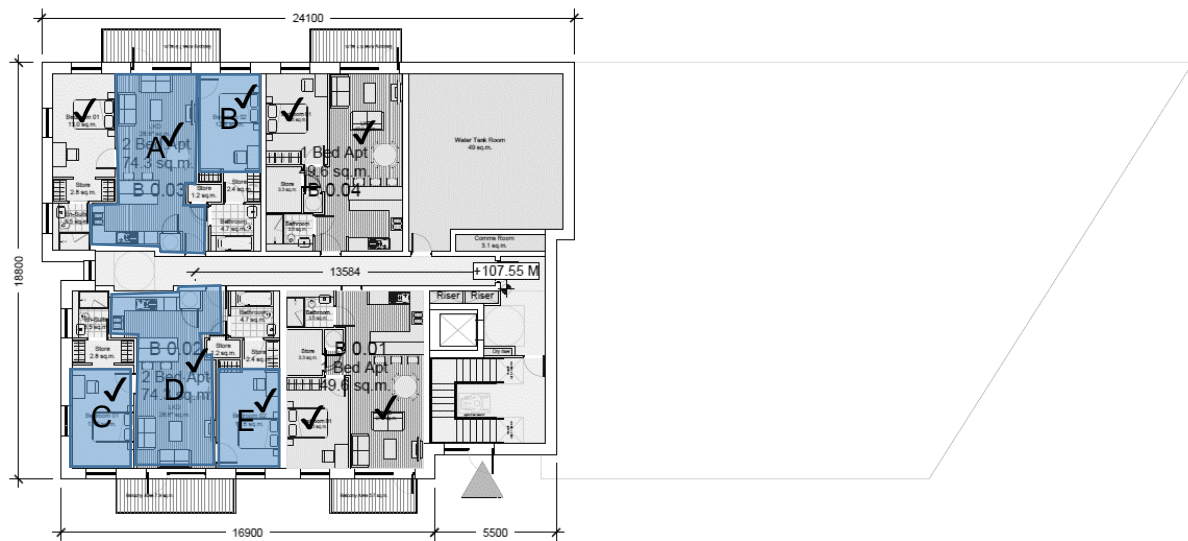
Block B - Ground Floor Assessed Rooms Highlighted in Blue
